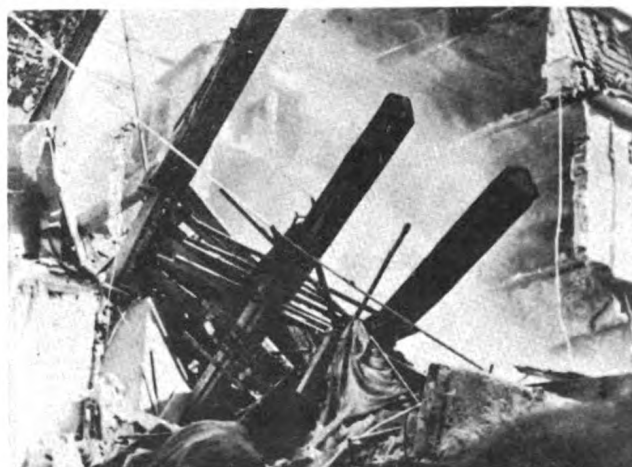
Captured photo showing damage to building 64 and connecting bridge between 64 and building 42.
